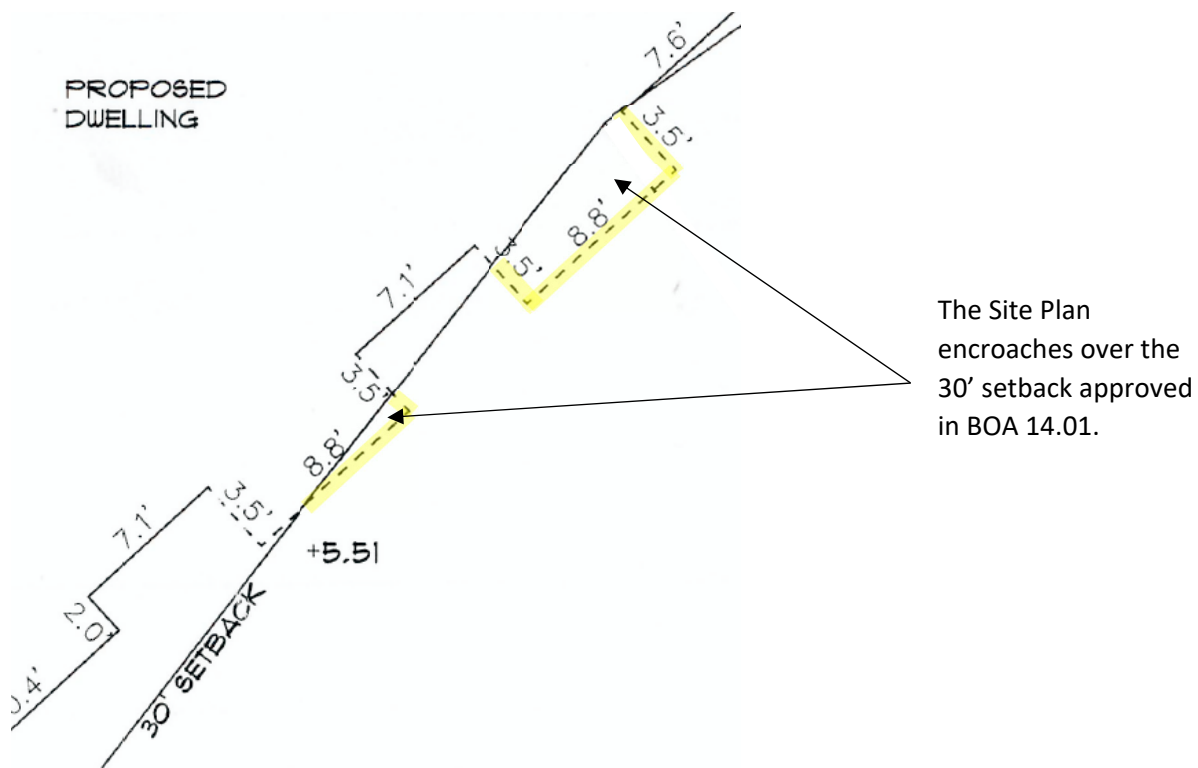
Encroachment of the Site Plan on the 2014 30' Front Setback
